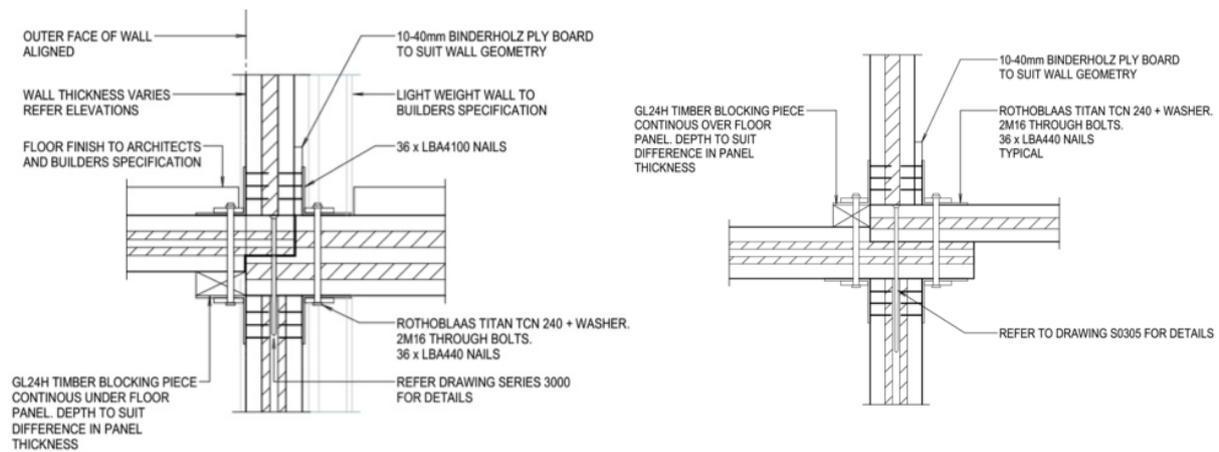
Typical hold down connections with varying floor and wall panel thicknesses
